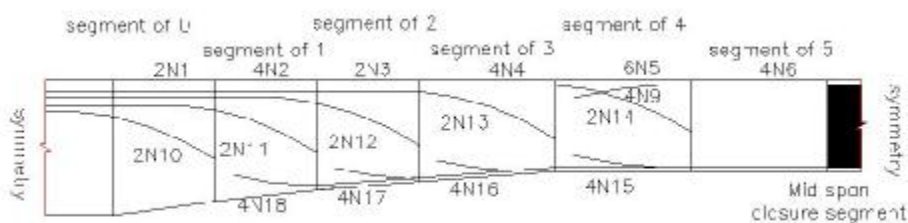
Concrete continuous girder bridgeprestressed steel beam layout
